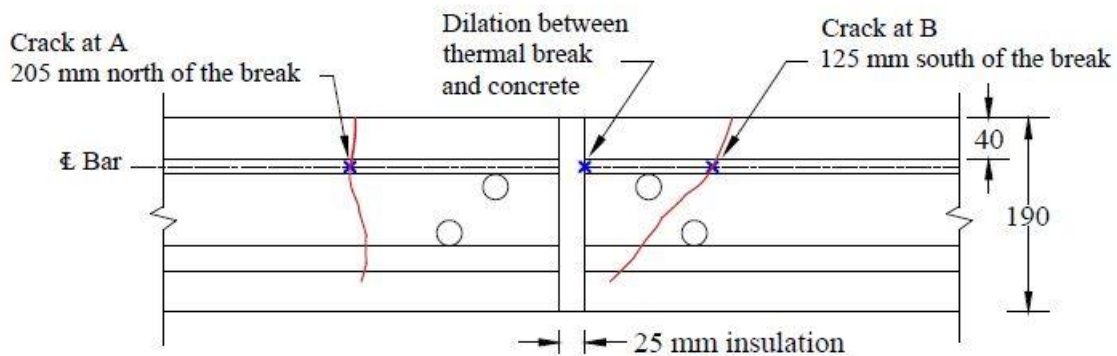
Dilation and cracking cross section on the west side for the 2<sup>nd</sup> specimen
